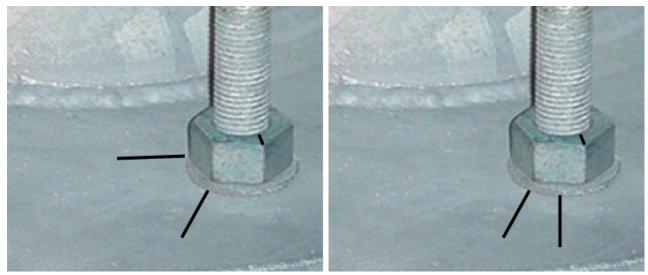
SNUG TIGHT CONDITION REFERENCE MARKS FOR BOLTS 1-1/2" DIAMETER OR LESS (LEFT) AND BOLTS GREATER THAN 1-1/2" DIAMETER (RIGHT)
